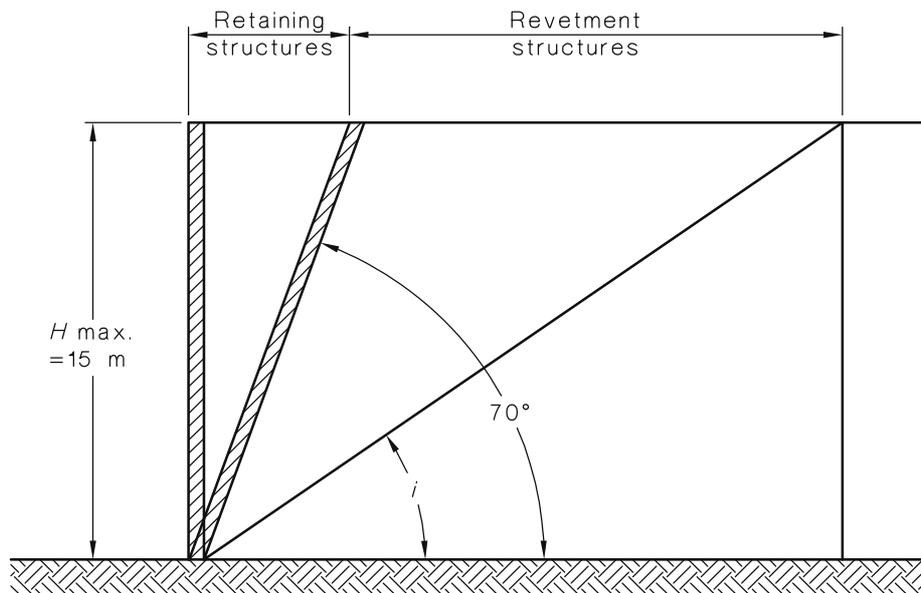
RETAINING AND REVETMENT STRUCTURES
